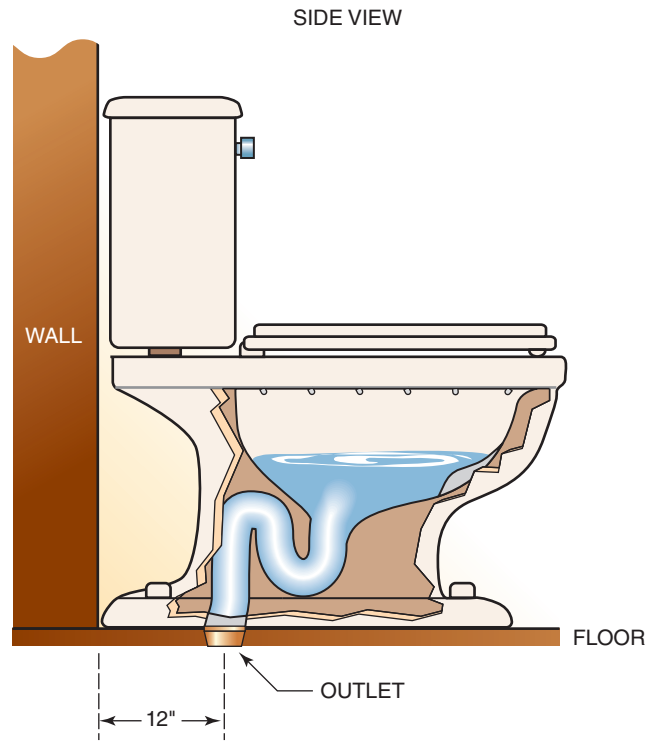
A 12" rough toilet is a standard one; and other distances from a back wall must be specified.
